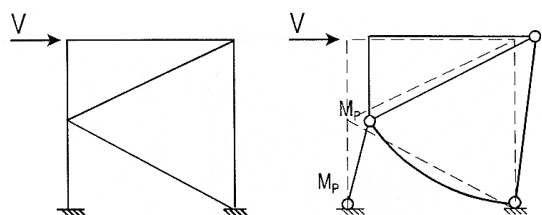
Plastic collapse mechanism of K-Braced frame with plastic hinge in column
